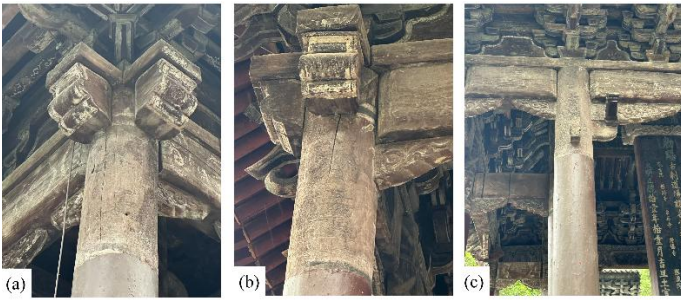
Typical damage conditions of mortise-and-tenon joints in ancient timber structures
